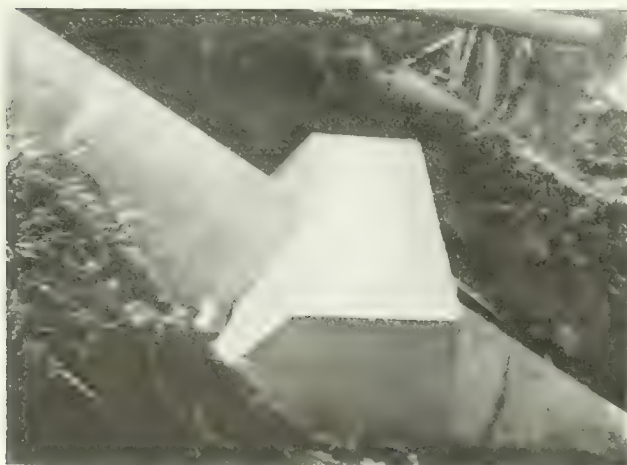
Concrete Anchor in a Syphon Section of the Pipe Line.
